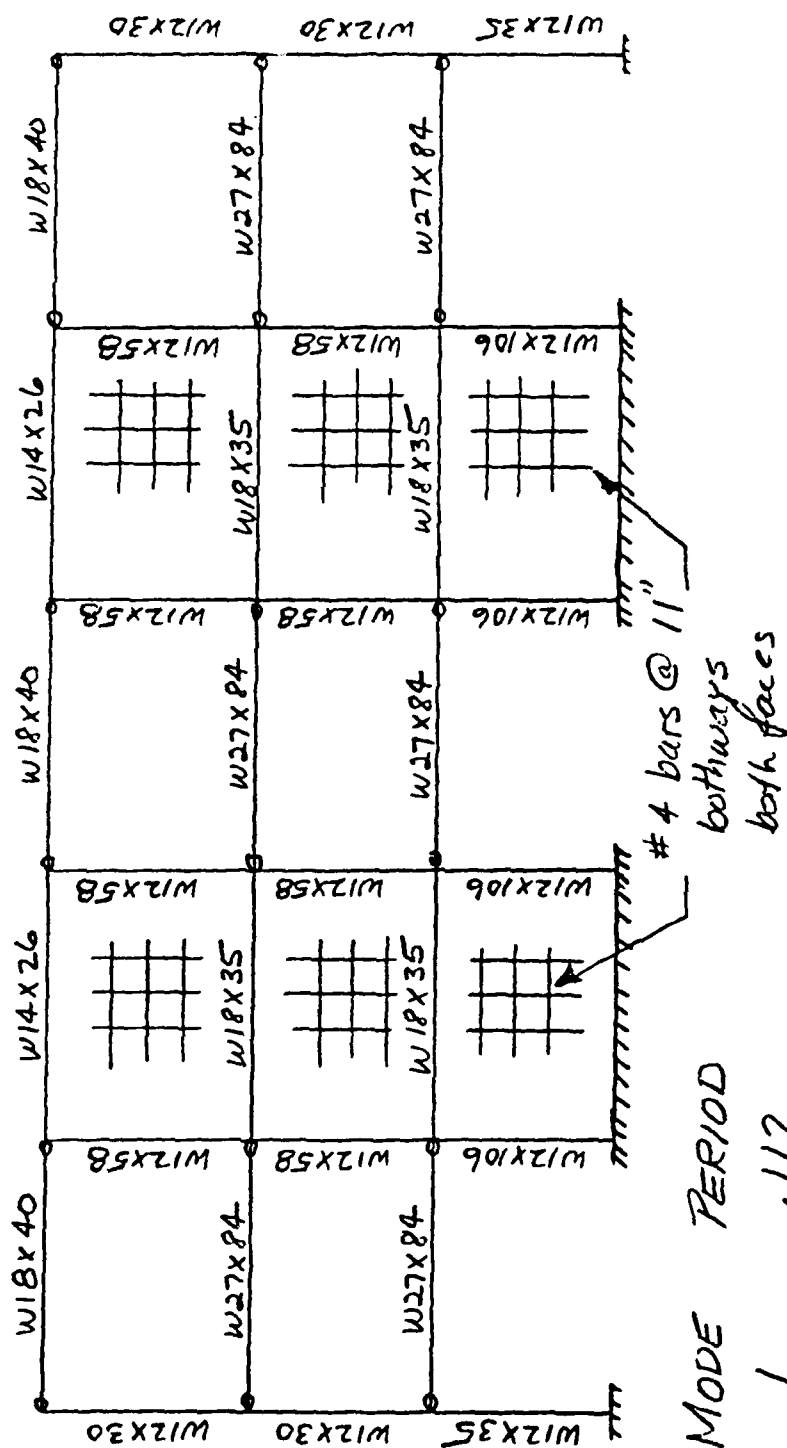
Shear wall frame, 0.30g base acceleration, 14-inch concrete wall.
